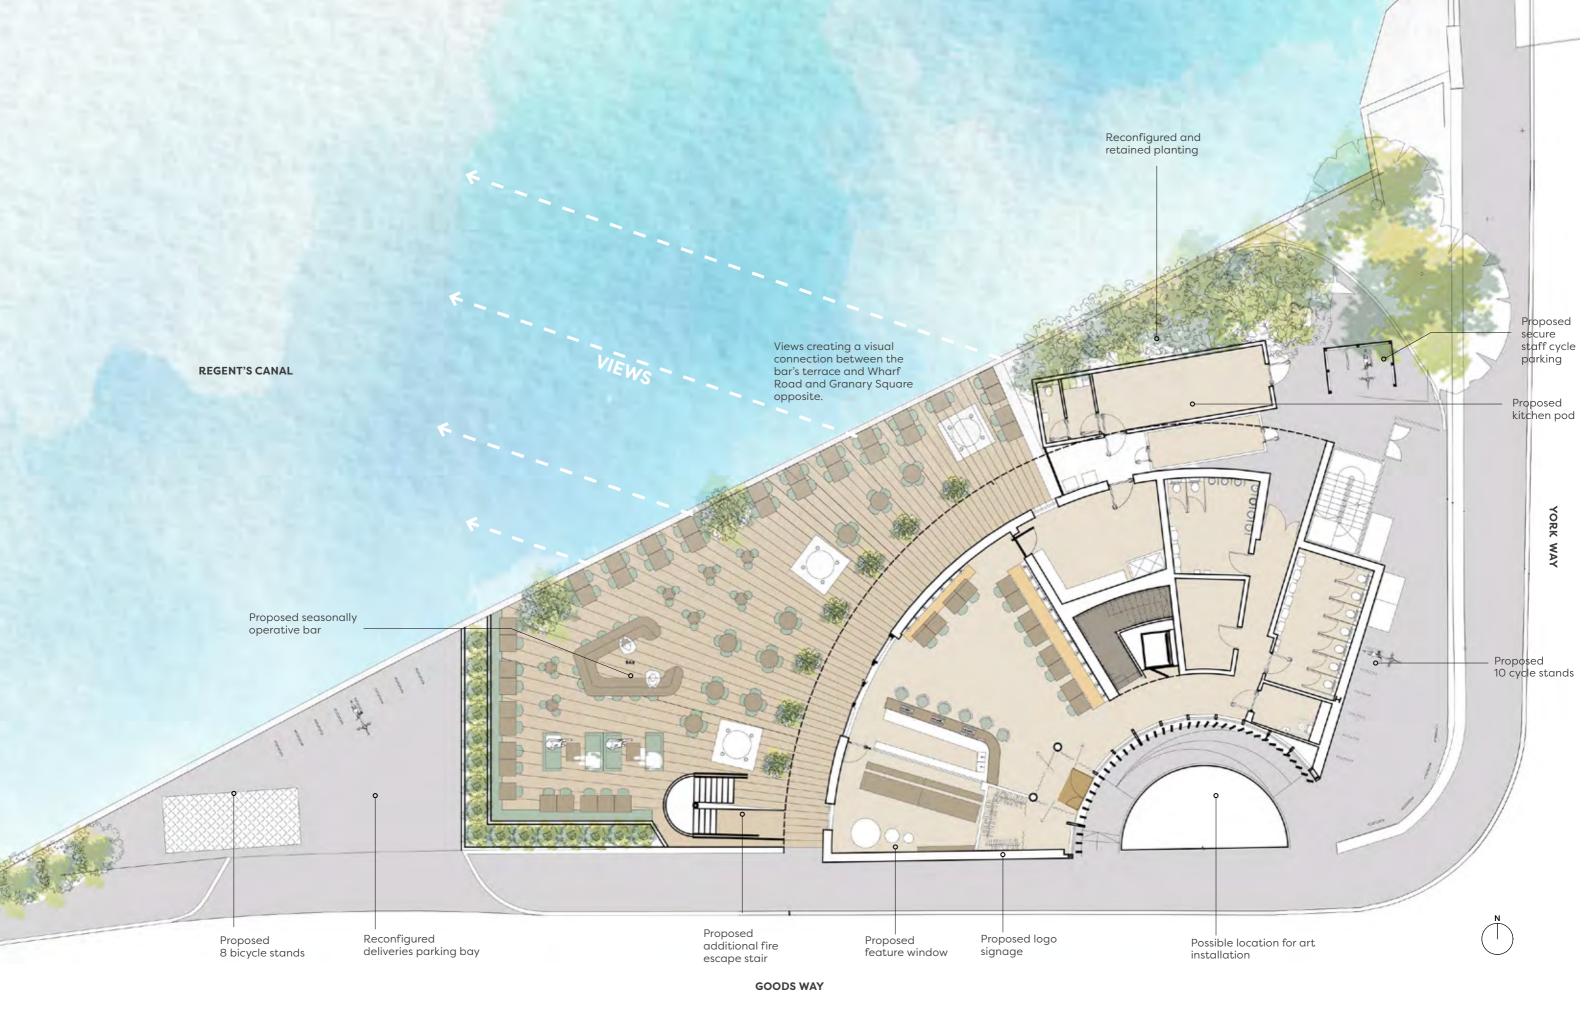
Illustrative Proposed Ground Floor Plan (Scale 1:100)
